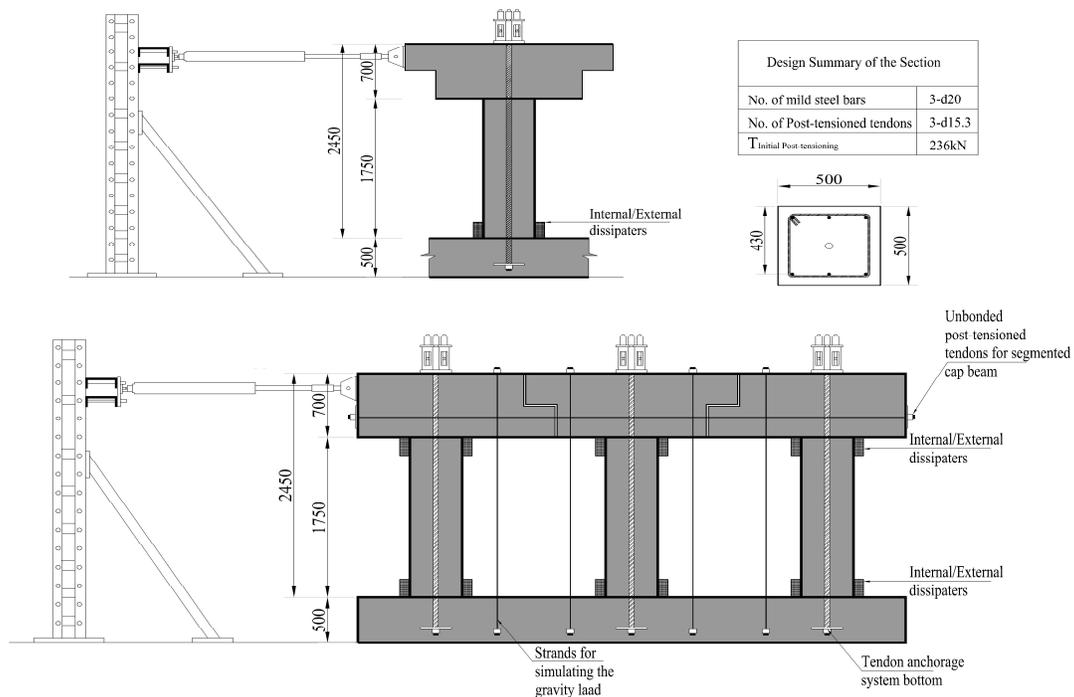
Experimental test setup, single pier (top); multi pier (bottom)
